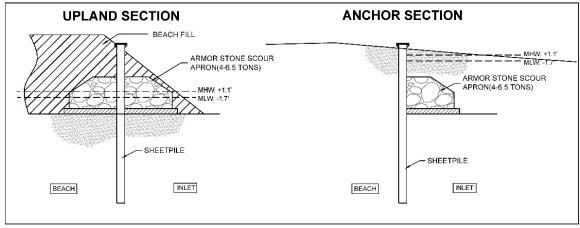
Terminal Groin Anchor and Upland Cross Sections
